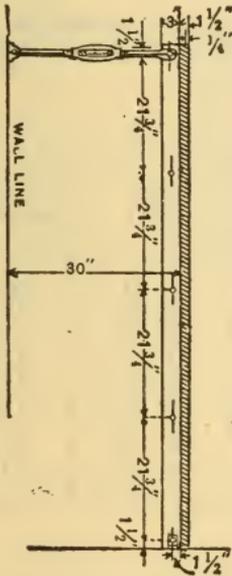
Showing Method of Bracing Switchboard Panel to Wall.
